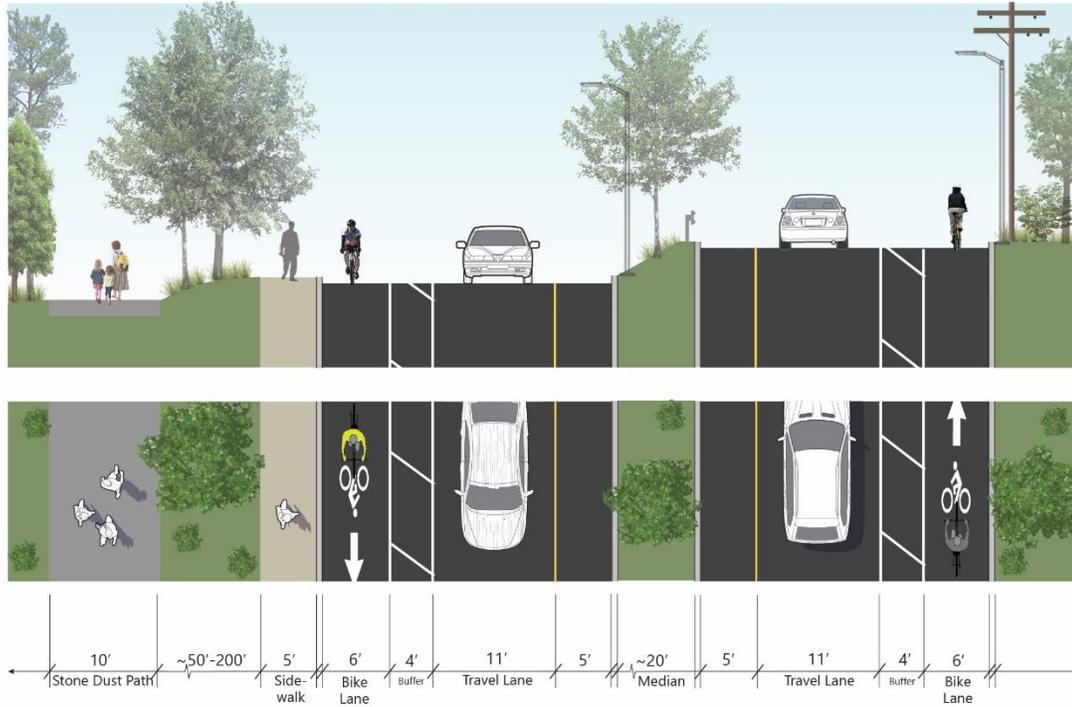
Section C-3: Long-term Recommendation for Woodland Road, facing north (DRAFT CONCEPT)
